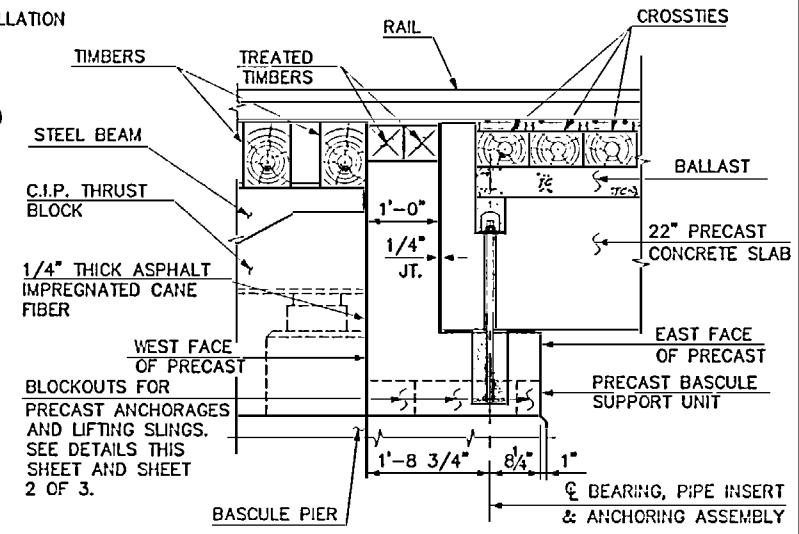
DETAILS OF ANCHORAGES @ EAST FACE OF BASCULE PIER SUPPORT
